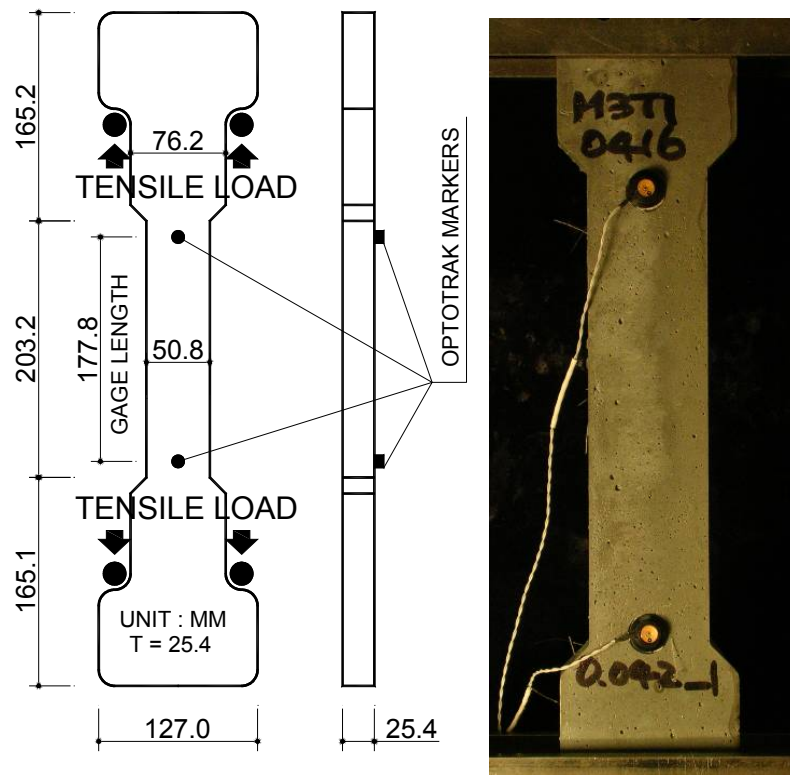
Tensile test specimen and setup using OPTOTRAK
